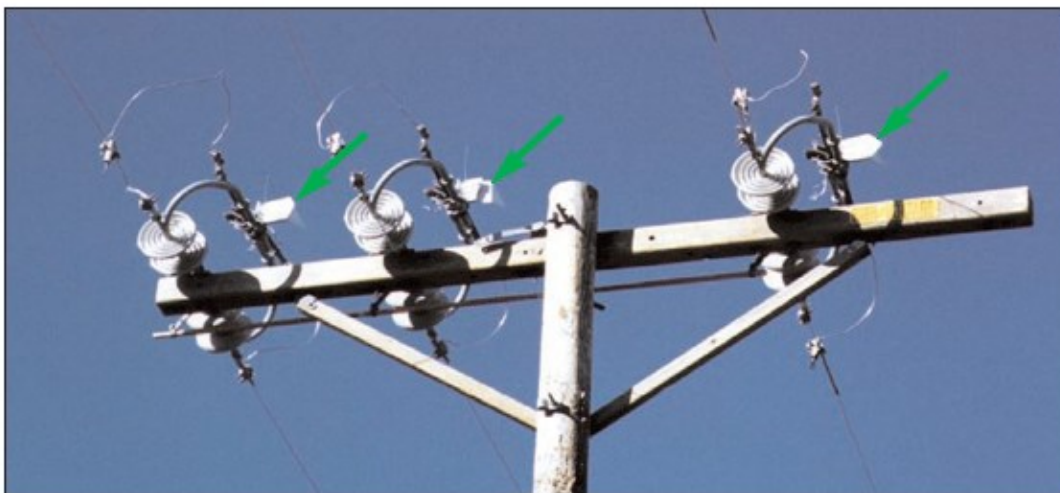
600 Amp KPF Air Switch, Crossarm Construction (Closed Position) with Arcing Horns and Snuffers
